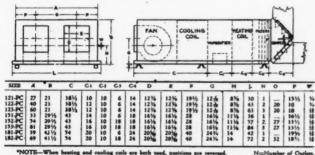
Another type of conditioner, for large structures, This unit will both heat and cool; also filter and humidify.
